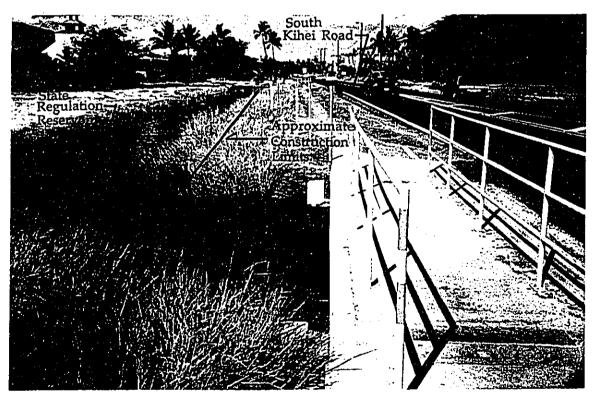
View to the North from Intersection of Halekuai St. & S. Kihei Road
